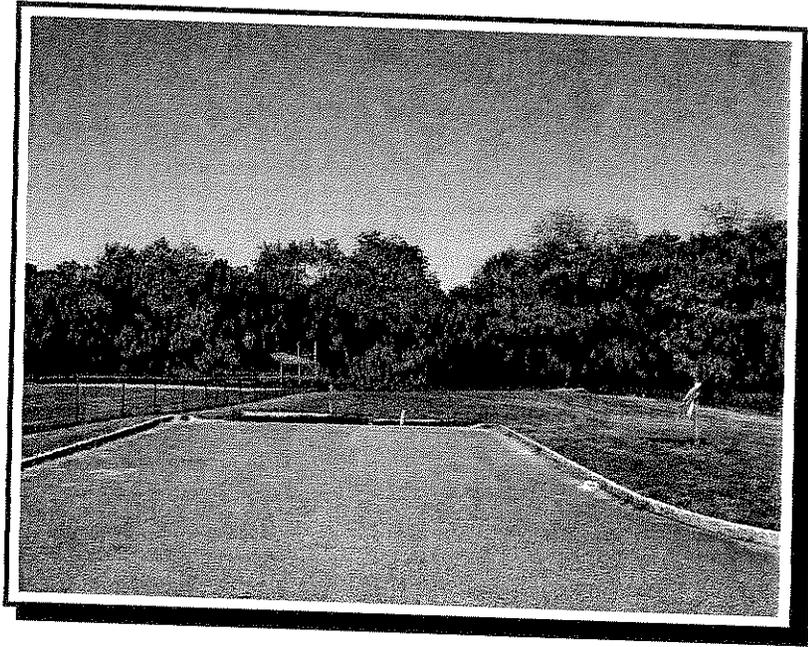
View from site looking east - southeast along remaining portion of access road. Note: railroad right-of-way located beyond treeline.
